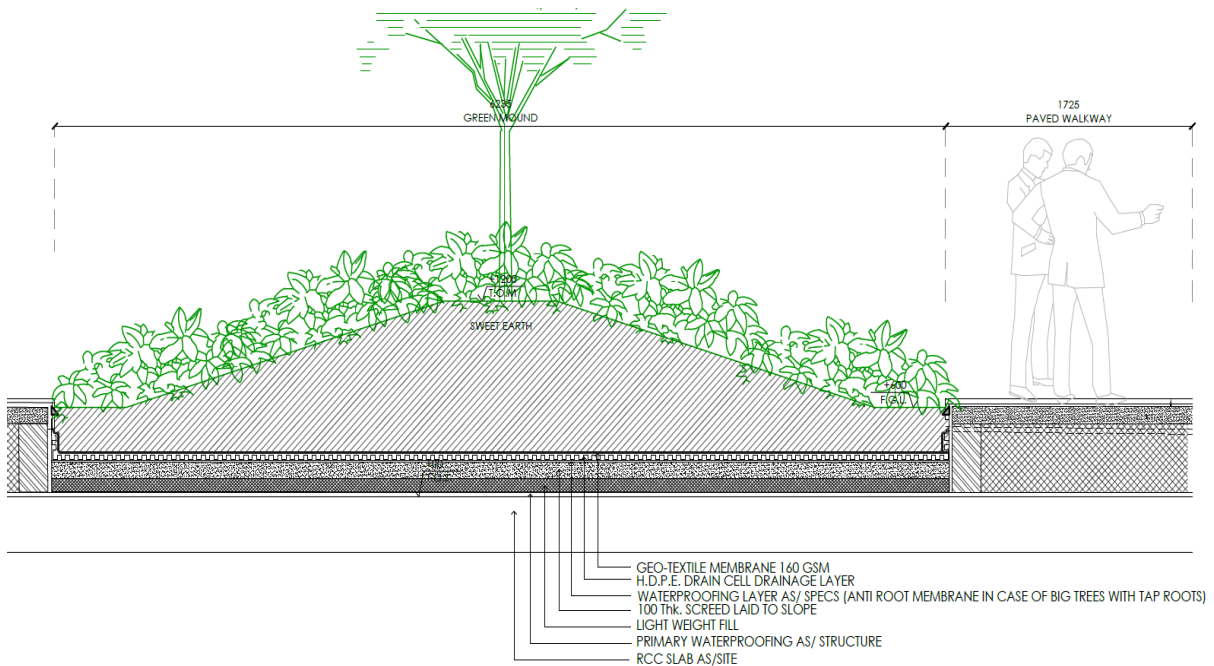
INSTALLATION OF ROOT BARRIER MEMBRANE FOR STRUCTURAL PROTECTION
